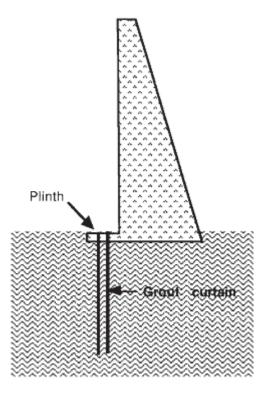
Schematic of general grout curtain wall (Weaver, K. and Bruce, D., 2007).
